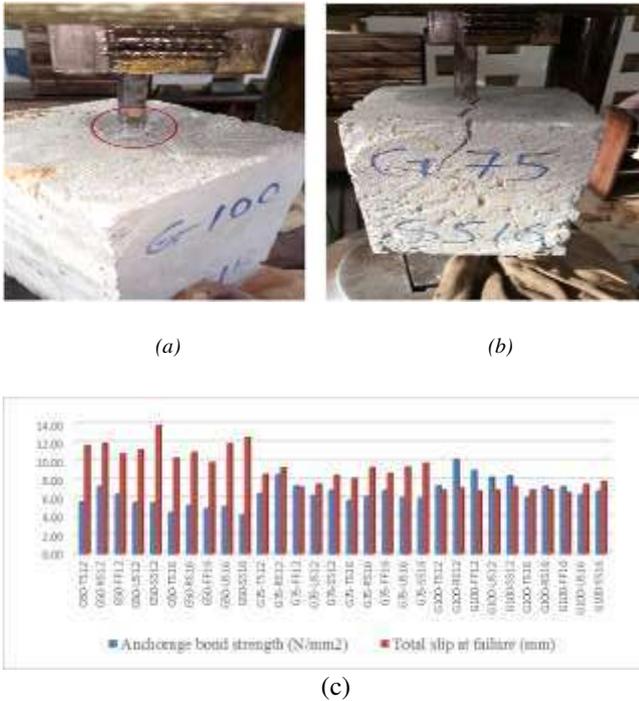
Mode of bond failure, anchorage bond strength and slip (a) shear failure (b) splitting failure (c) anchorage bond strength versus slip
